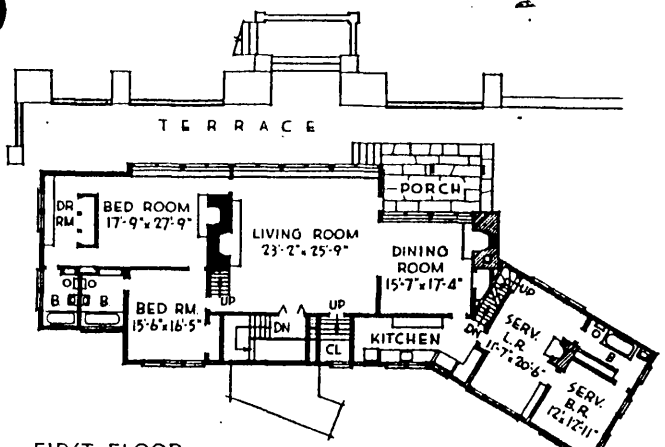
Site and Floor Plans; from *House Beautiful* article
